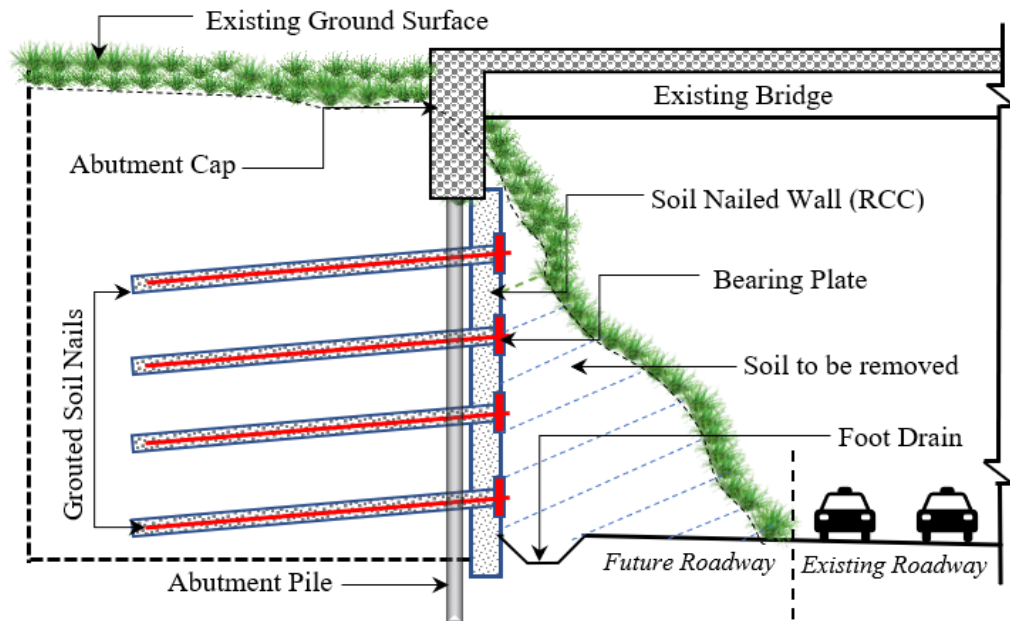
Road widening under the existing bridge (modified after Porterfield et al.,1994).
